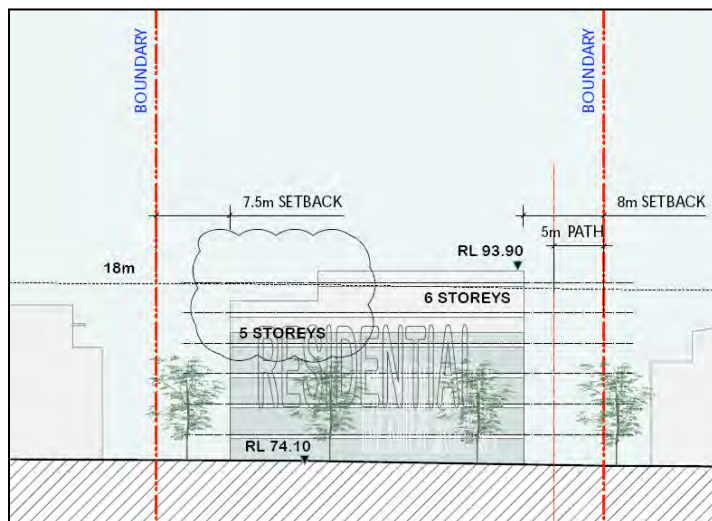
Proposed Southern Elevation - View of Building D Envelope from Finlayson Street
